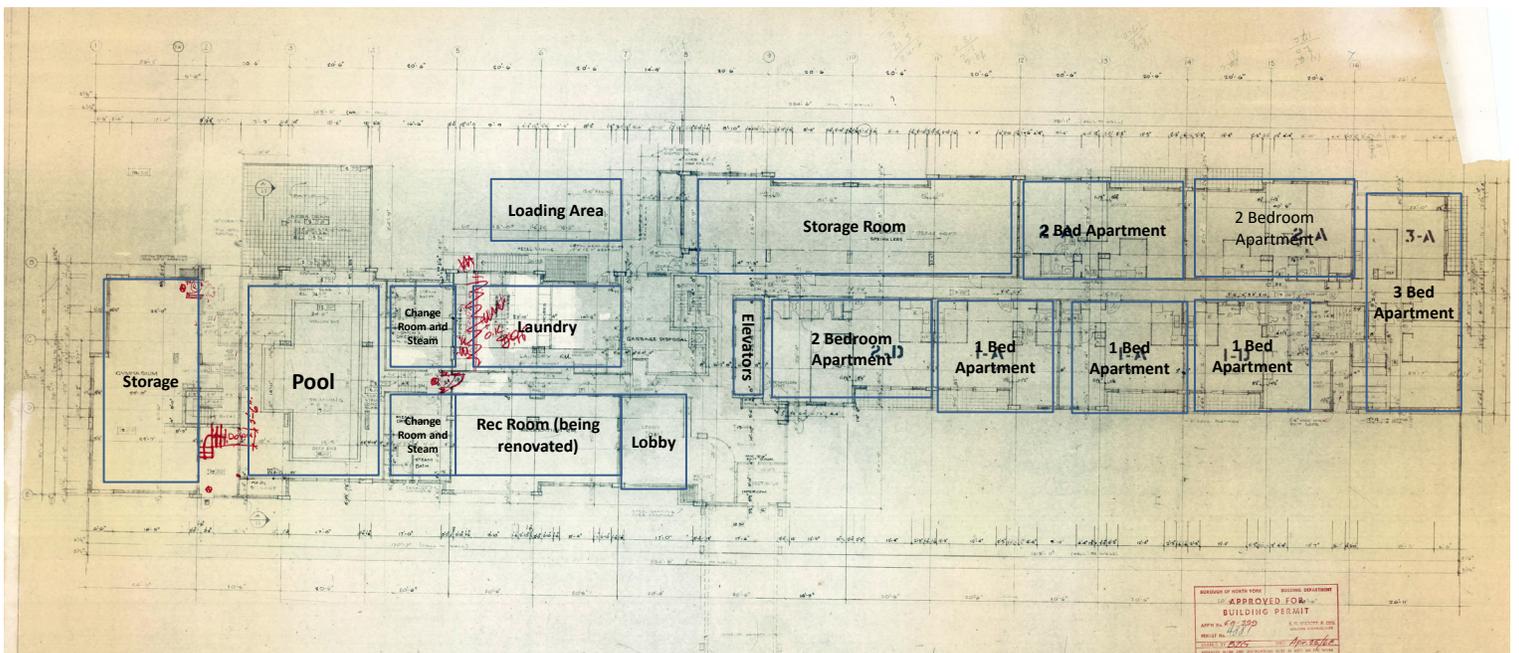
Ground Floor Plan - 10 Grenoble Dr
